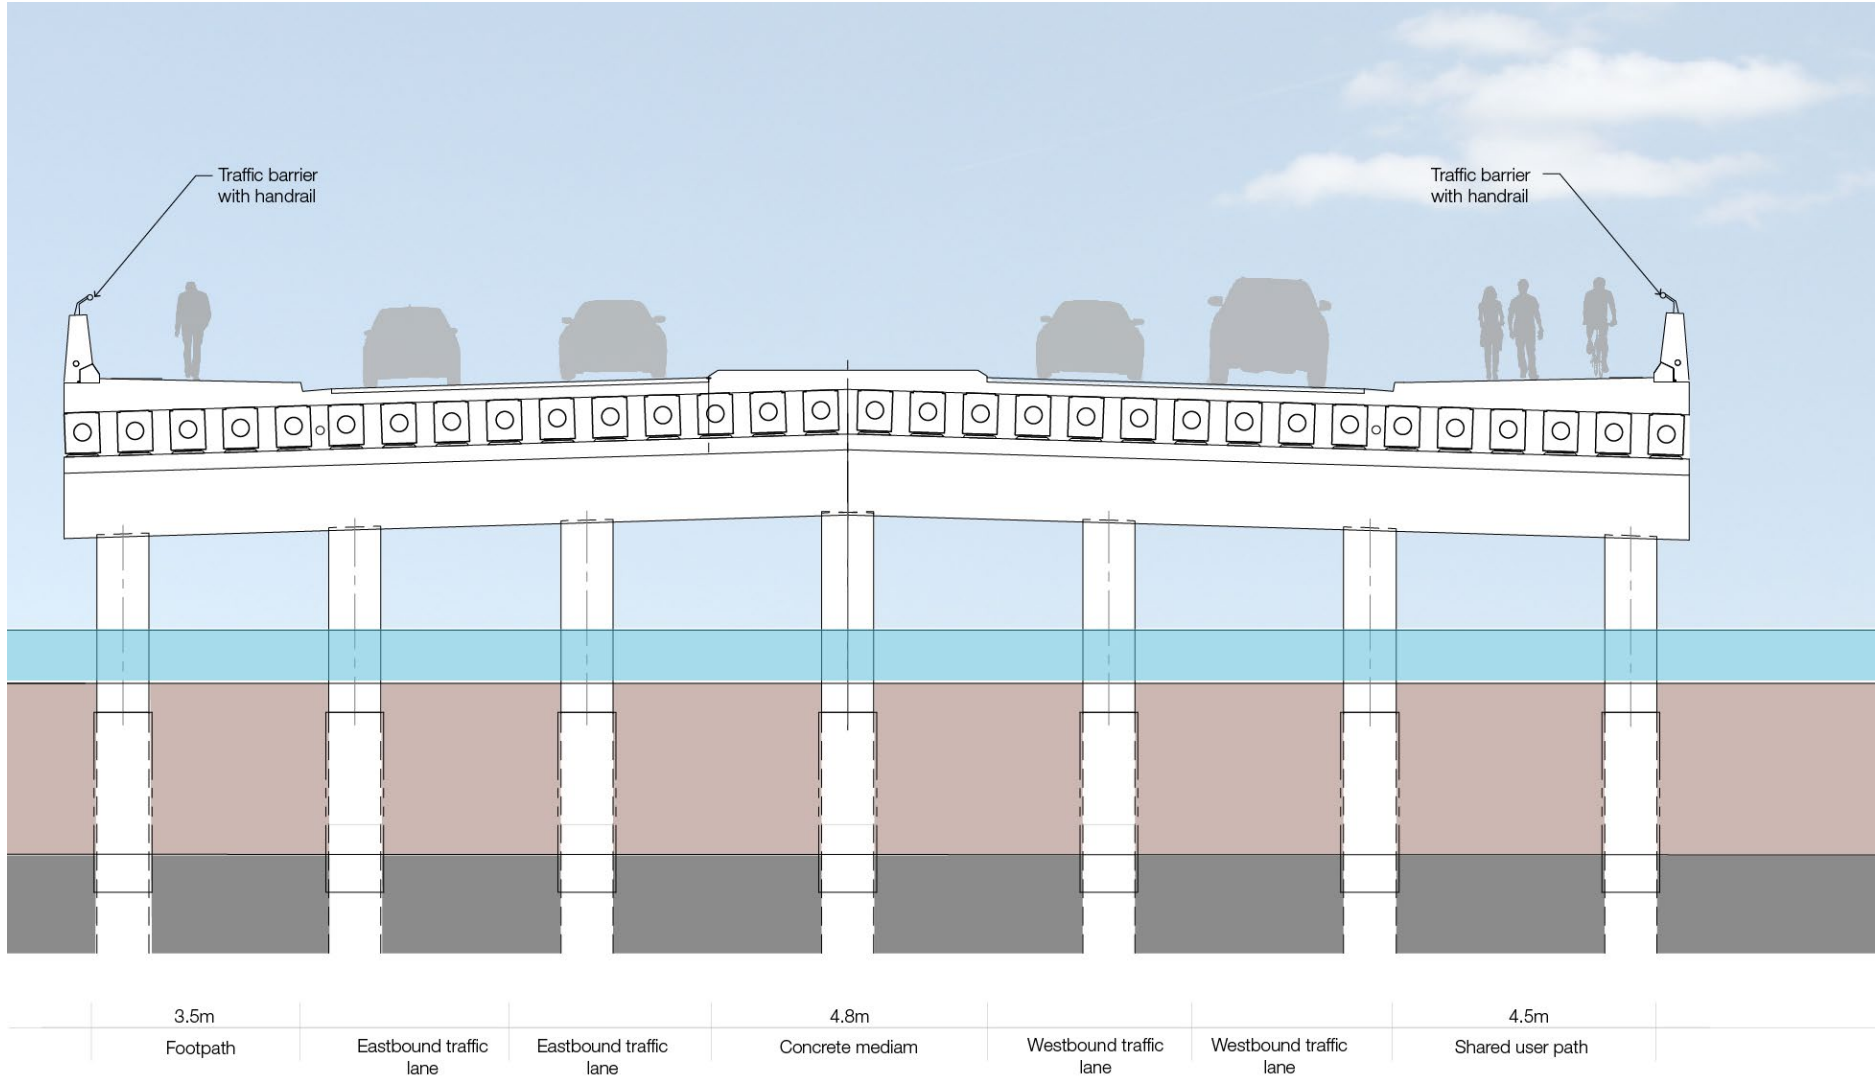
Typical section through Bridge over Bells Creek for the ultimate phase
